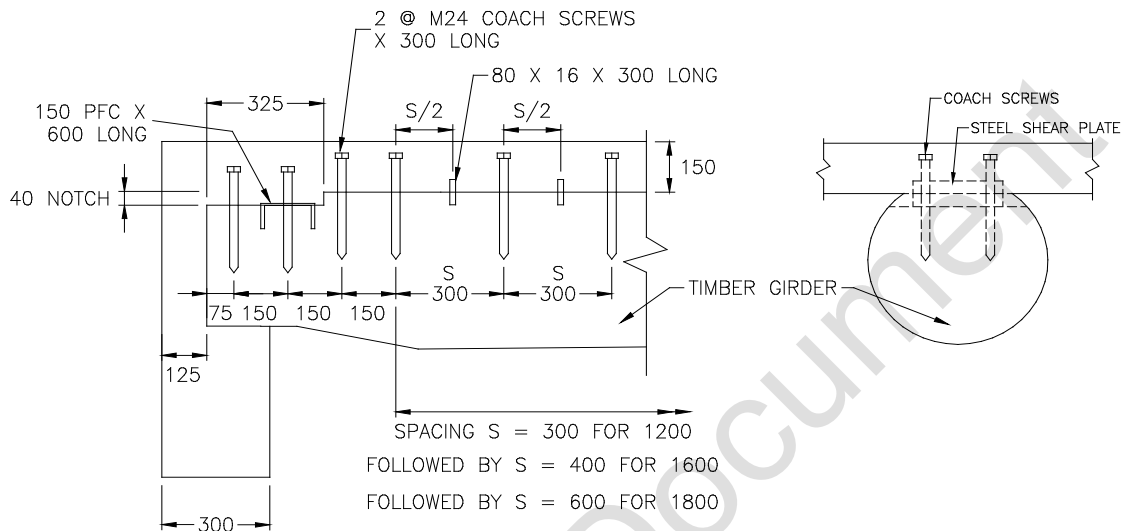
Typical Detailing - Macleay River Bridge
